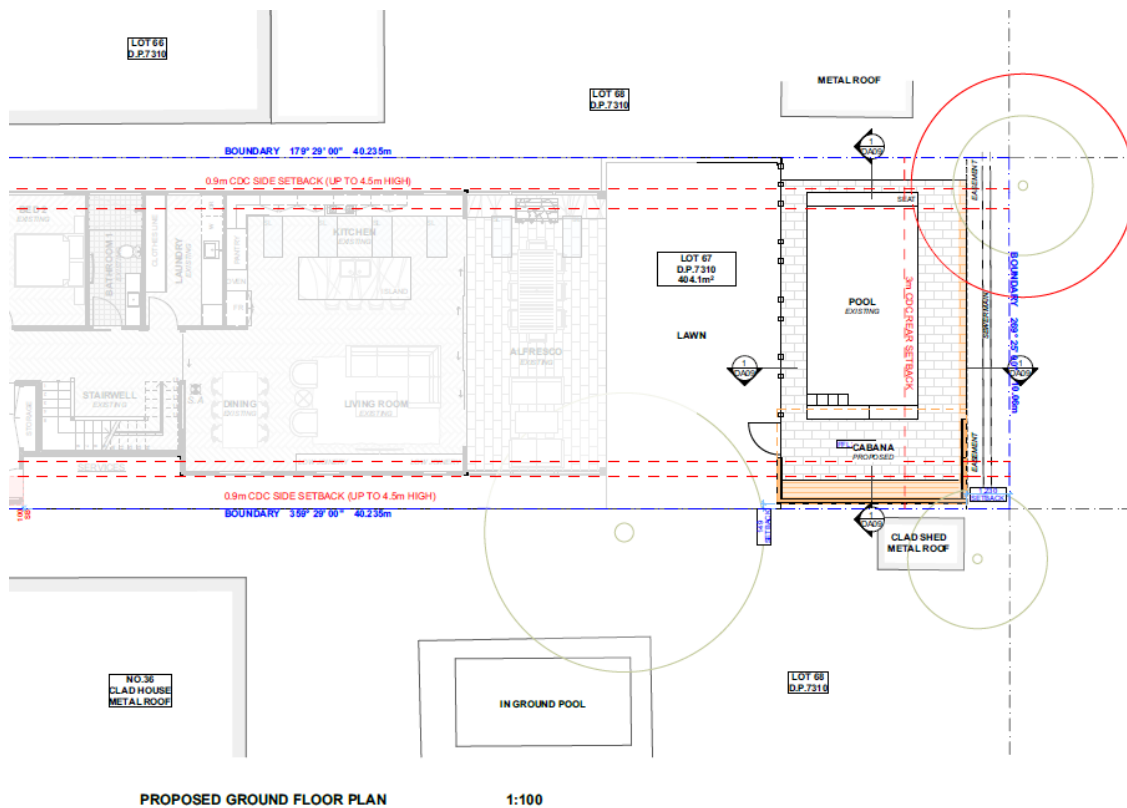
Proposed Ground Floor Plan (Action Plans, 2025)
